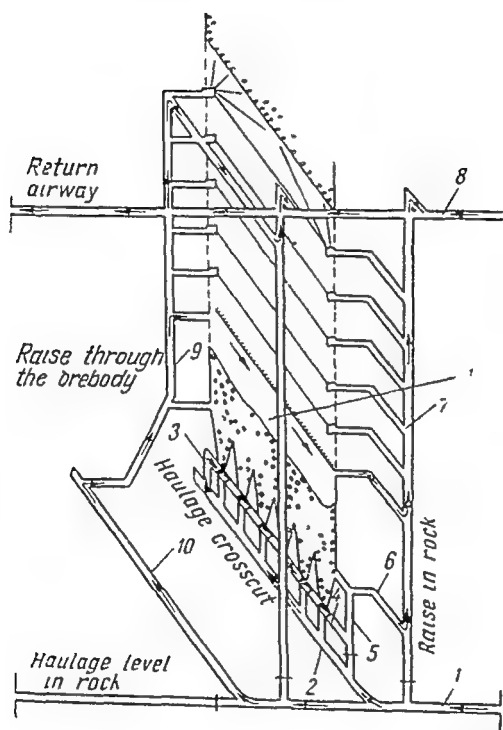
Ventilation layout for the stoping of a massive deposit by long horizontal holes
